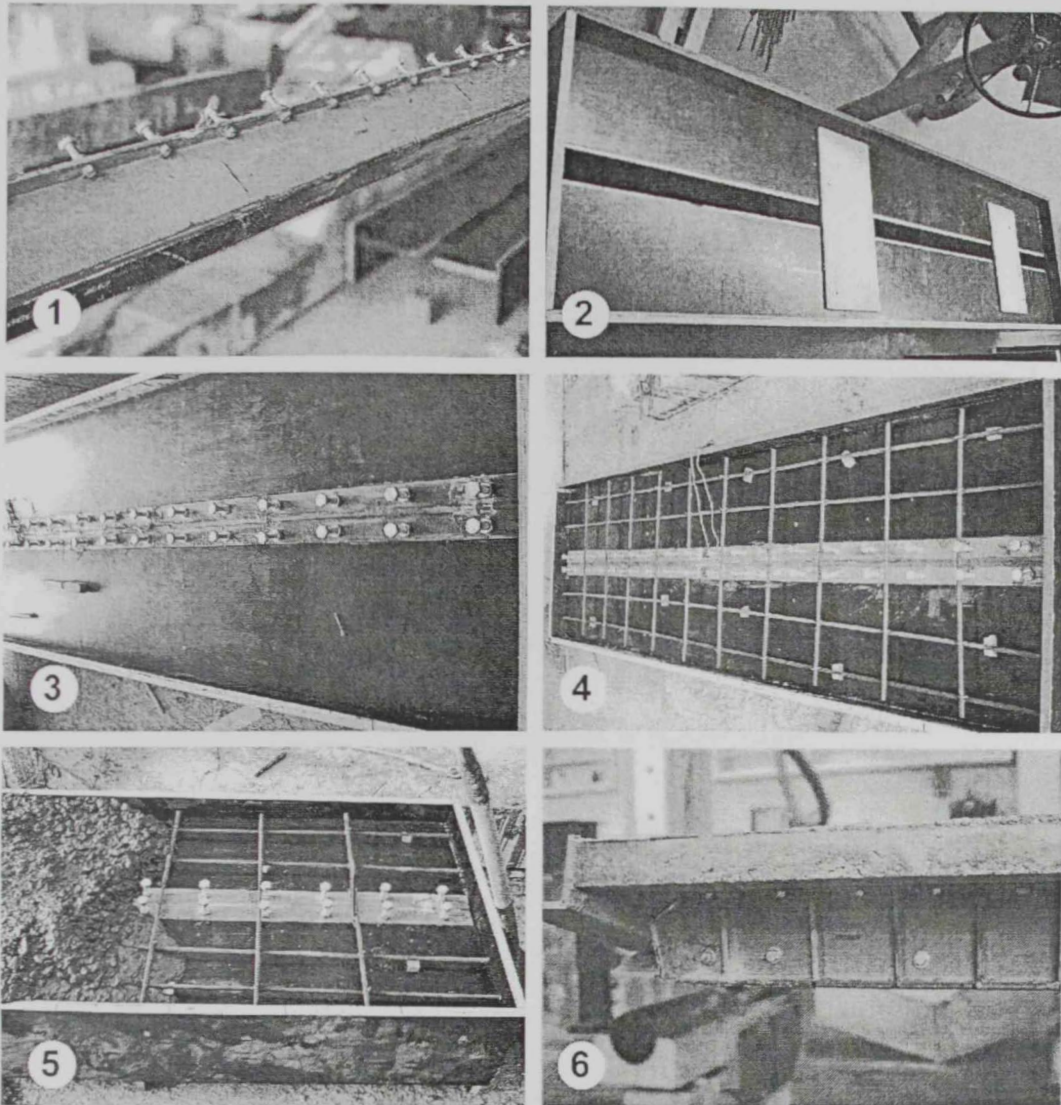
Test beam fabrication: 1. GFRP, CFRP and shear connectors, 2. Formwork ready to receive beams, 3. Beams with strain gauges placed in forms, 4. Reinforcing in place and beams ready for concrete topping, 5. Pouring concrete into formwork with beam, connectors and strain gauges all in position, 6. Finished beam with stiffeners, bolts and fly braces in place.
